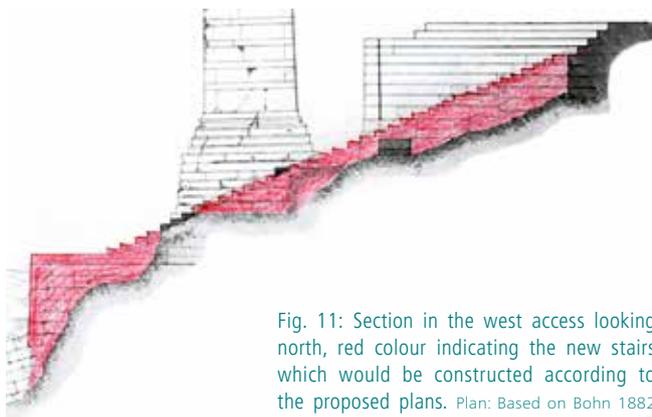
Section in the west access looking north, red colour indicating the new stairs which would be constructed according to the proposed plans. Plan: Based on Bohn 1882
